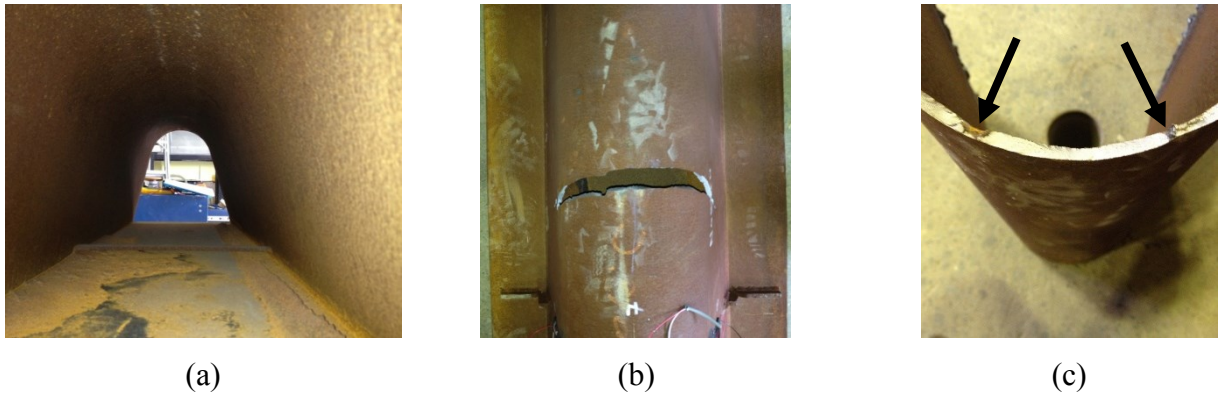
Specimen C9 (a) condition inside section prior to testing, (b) fracture on bottom of rib, (c) corroded pit (left) and “pinhole” (right).
